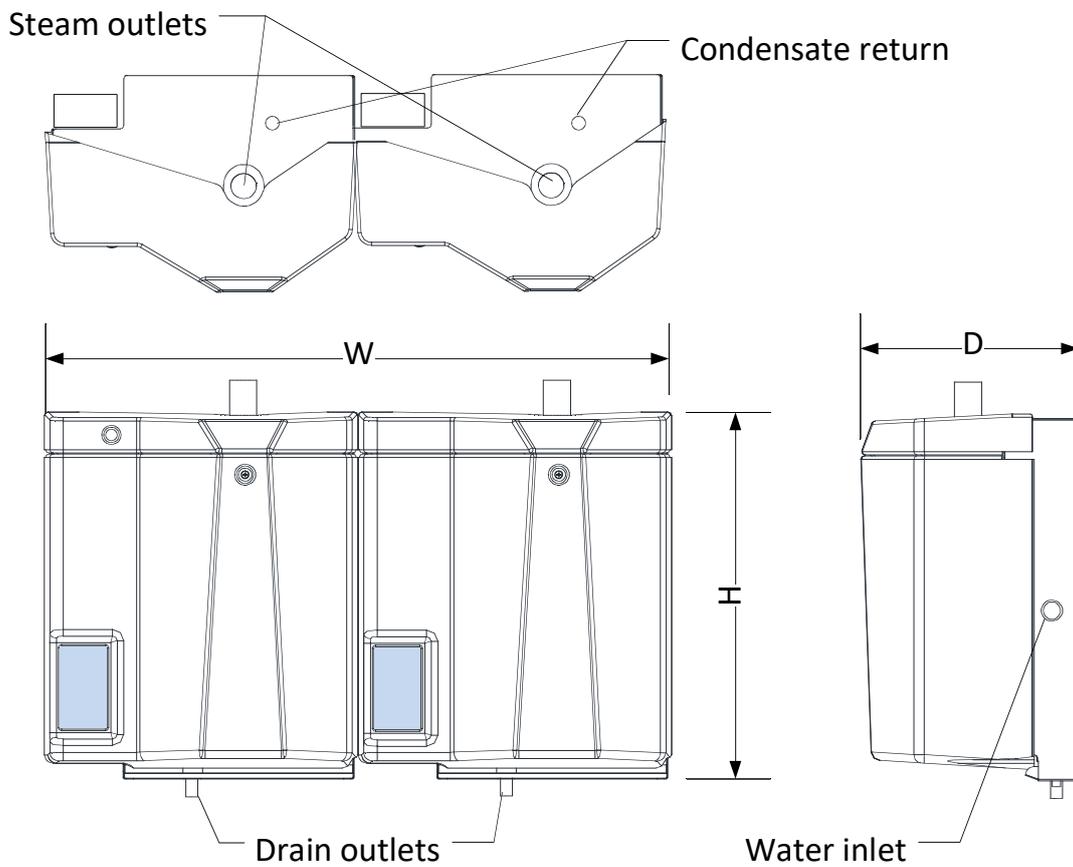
, IER Dimensions, two modules, model IER24, 34, 44 & 62
